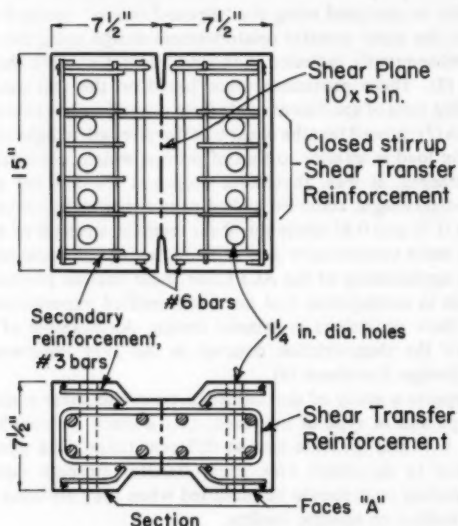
Typical Specimen (1 in. = 25.4 mm)
